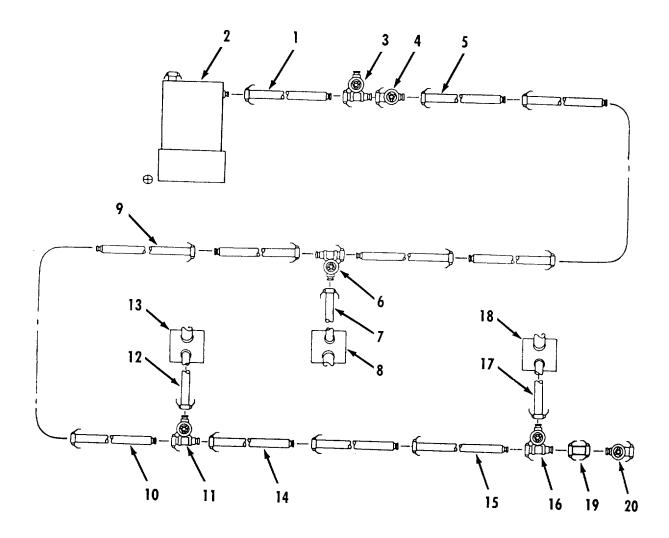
Fuel System - Primary 600 GPM Pump Output to Filler Hose of Fuel Tanks Removal.
